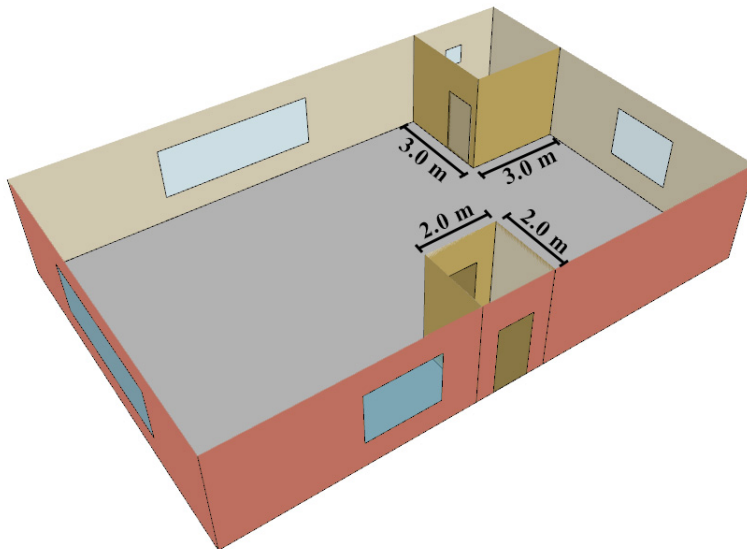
Floor plan of one apartment. All apartments had identical floor plans.
